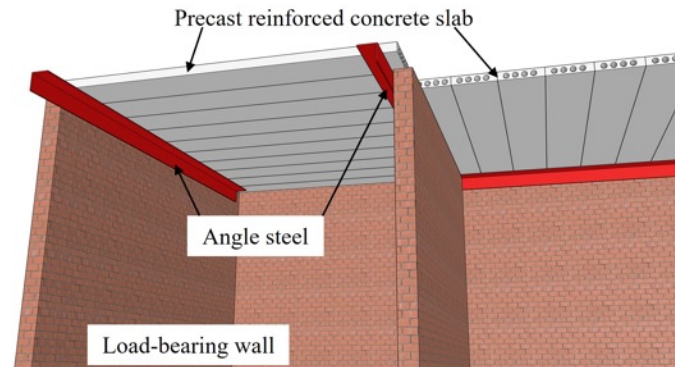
Schematic diagram of precast slab floor reinforcement measures.
